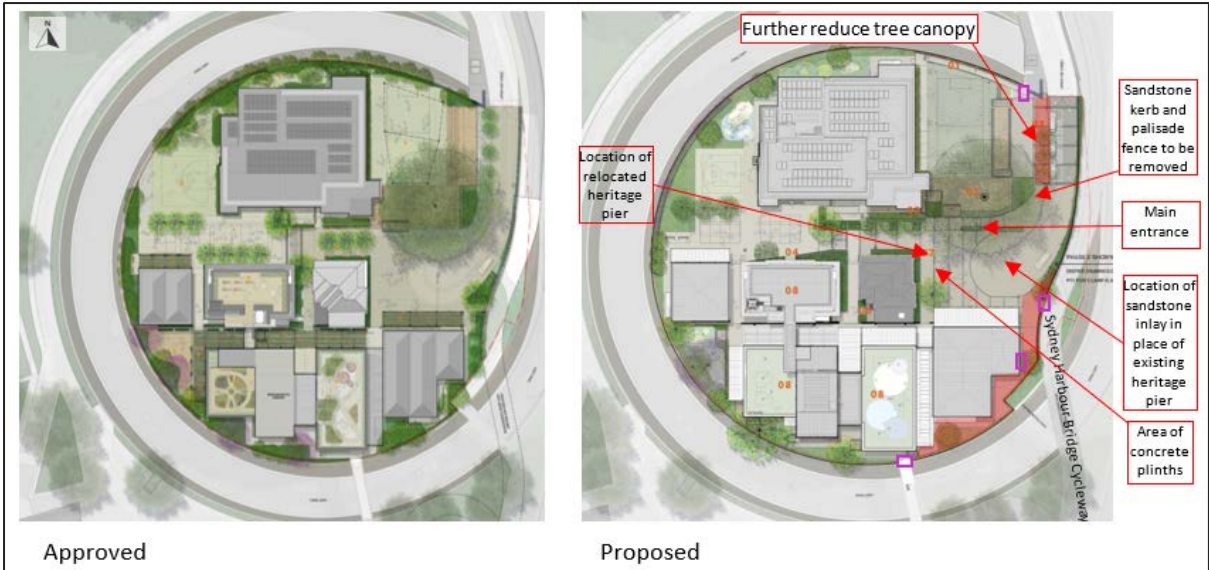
| Landscape modifications to improve access (Source: Modification Report 2021)
